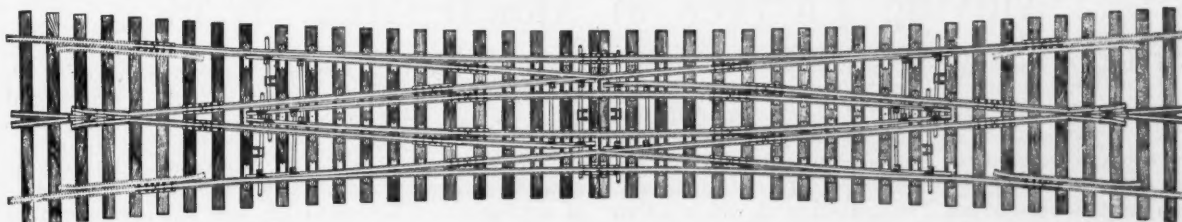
DOUBLE SLIP CROSSING OF THE PLAIN BOLTED TYPE
